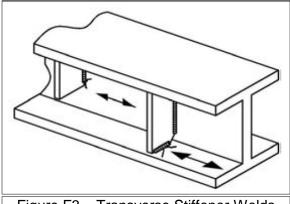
Transverse Stiffener Welds (Illustrative Example)
